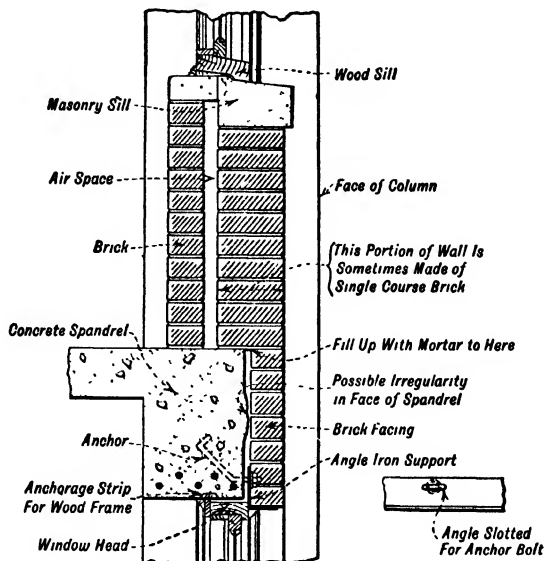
Spandrel Beam Faced with Brick, with Brick Curtain Wall. (See p. 742.)
